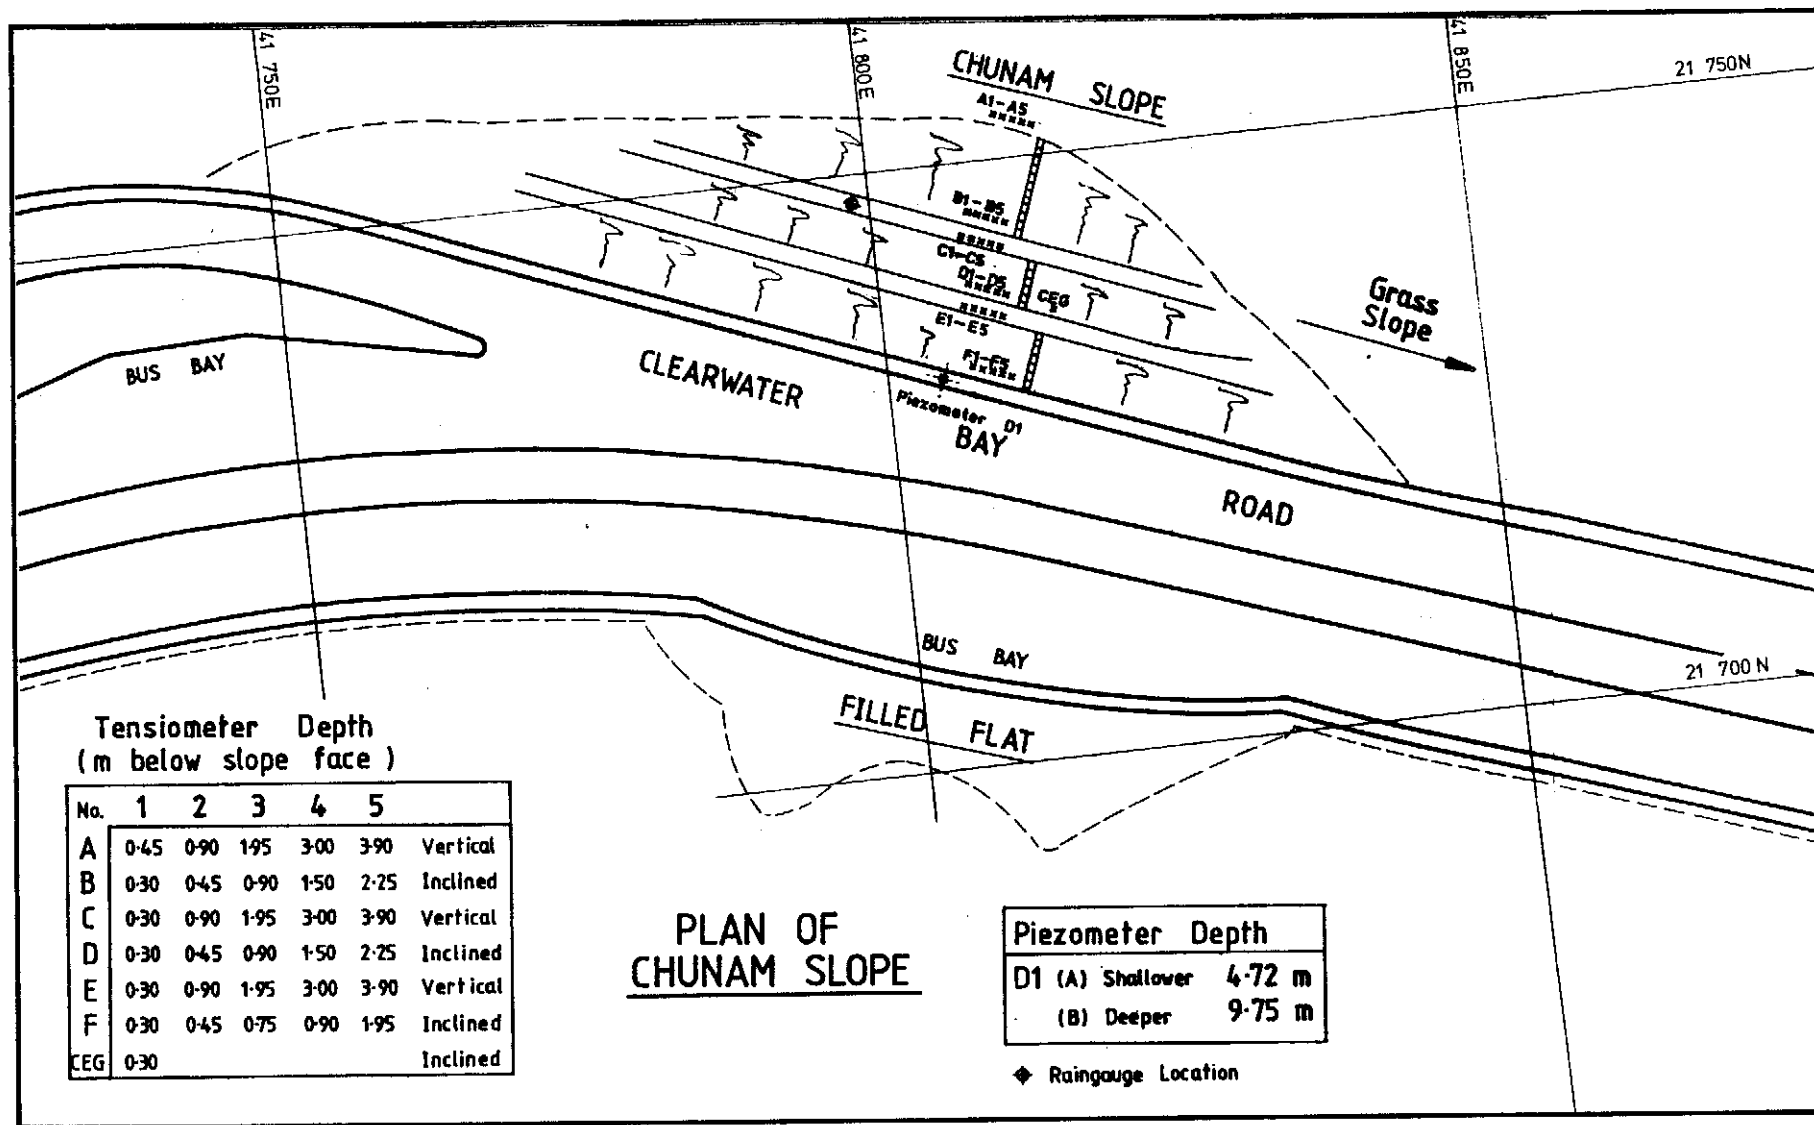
Site plan of the chunam slope, Clear Water Bay Road (see figure 1.7)
